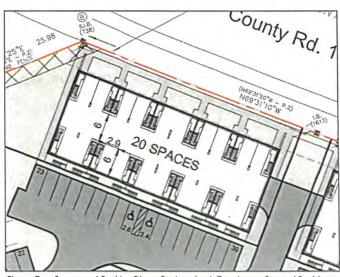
Conceptual Parking Plan - Back-to-back Townhouse Covered Parking
